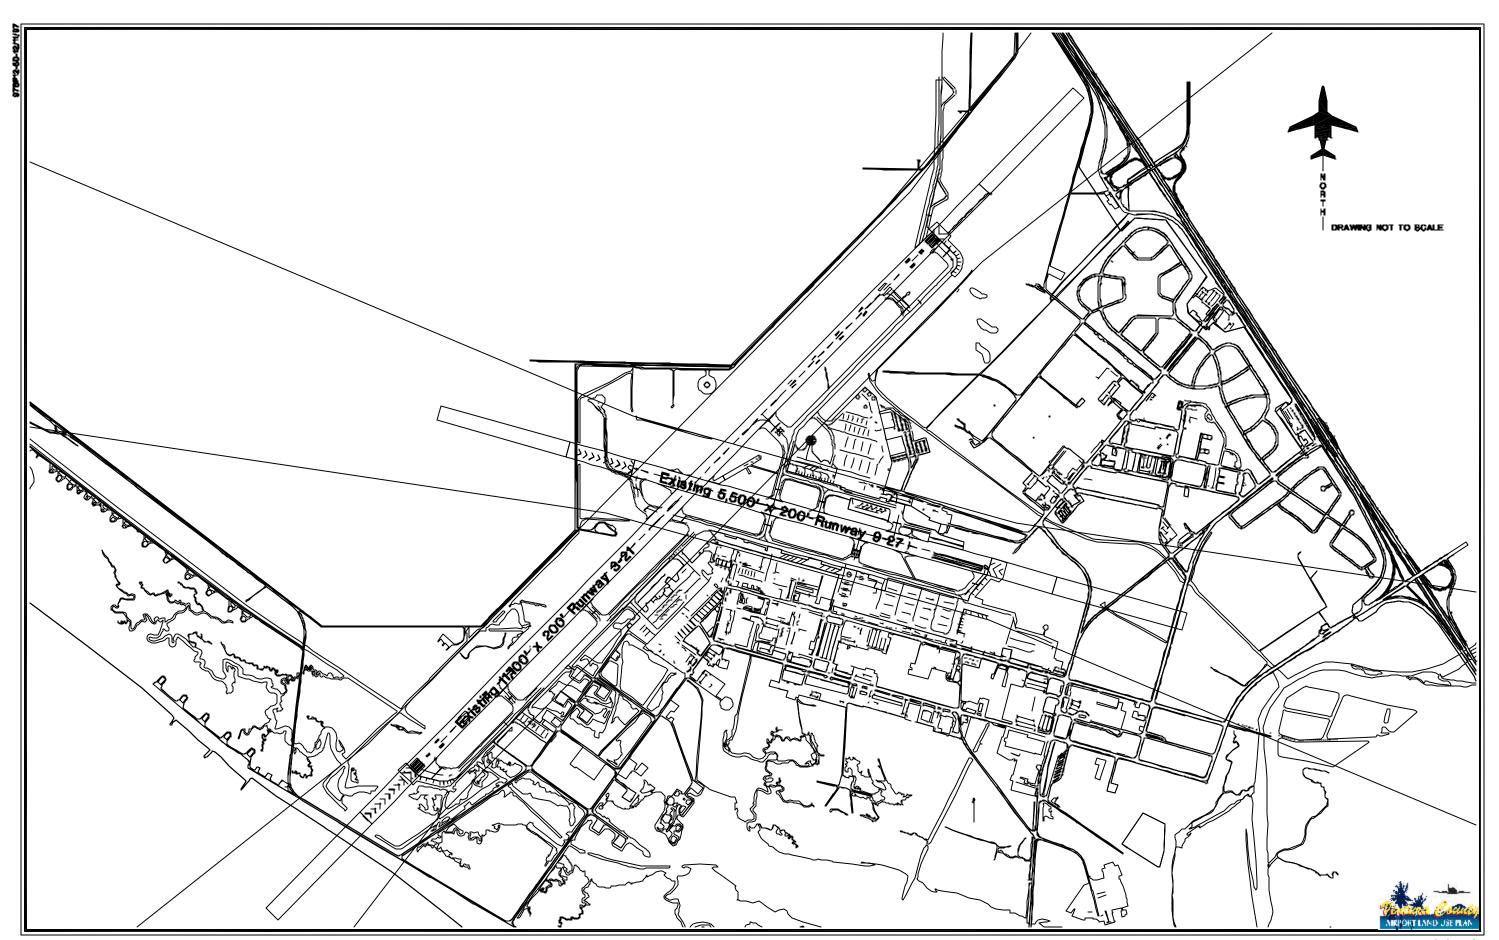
D NAS POINT MUGU AIRPORT LAYOUT PLAN
